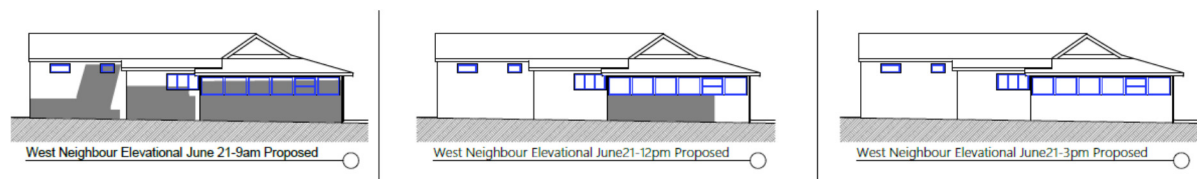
An extract from amended shadow plans of the northeast elevation of the dwelling at 22 Delecta Avenue (i.e. the elevation of the adjoining residential site which faces the subject site).
